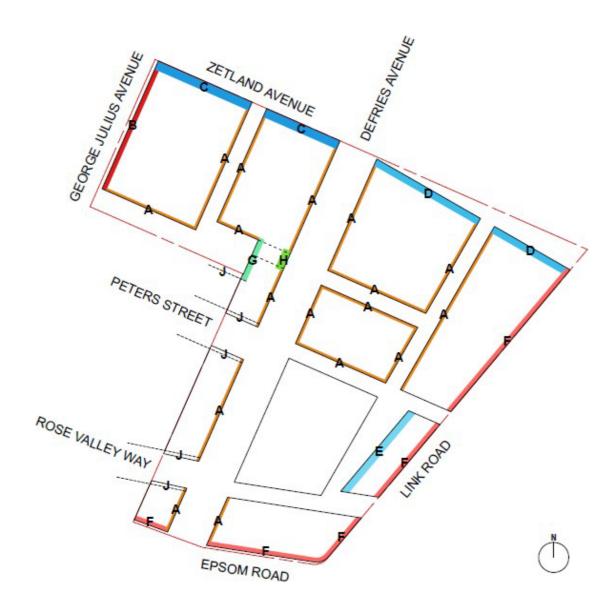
Figure XX Alternative Built Form - 118-130 Epsom Road and 905 South Dowling Street, Zetland
